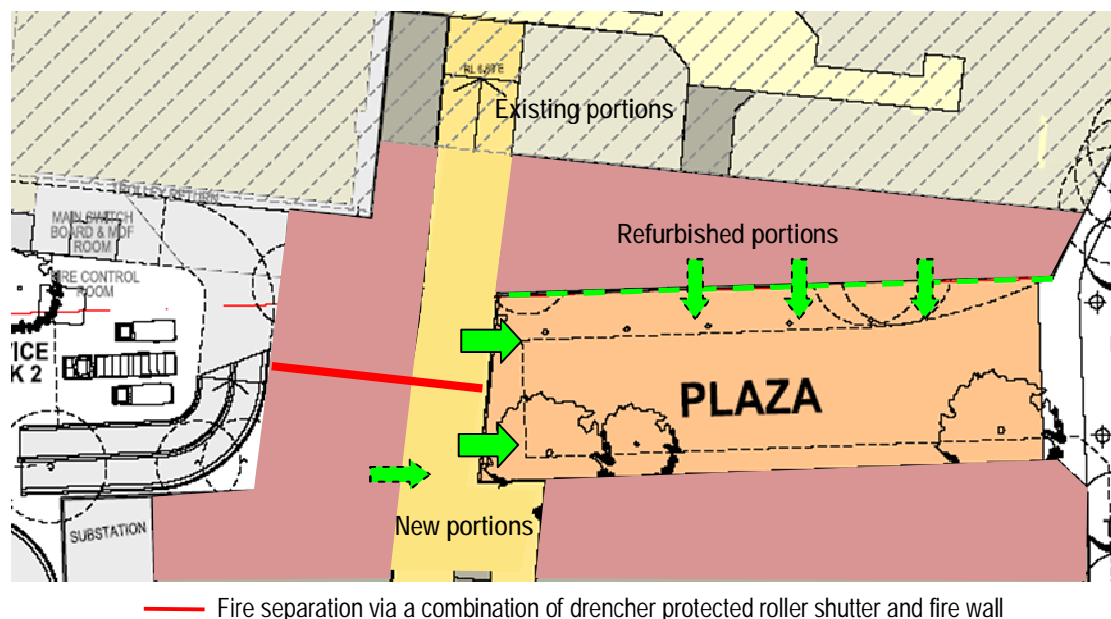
Proposed fire separation and egress provisions – Ground Floor
